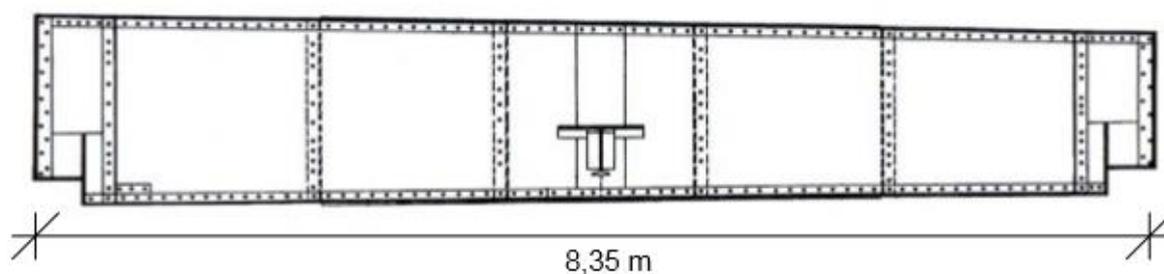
FRONT VIEW OF THE MAIN STEEL GIRDER FOR AN INVESTIGATED STEEL BEAM BRIDGE, SB-D3.4
